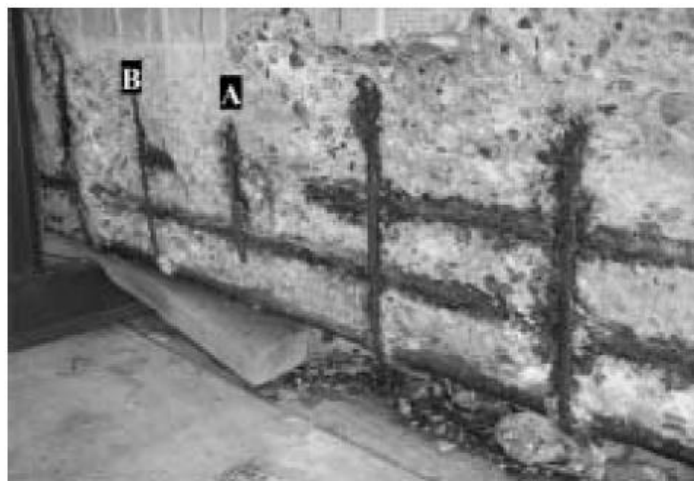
Chloride-induced corrosion damage to reinforced concrete deck girder removed from Brush Creek Bridge in 1998 [13]
